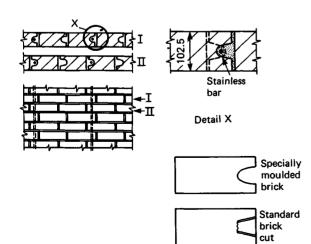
Thin but stable boundary walls formed with special or cut bricks (concrete blocks also as in Figure 15.16)
